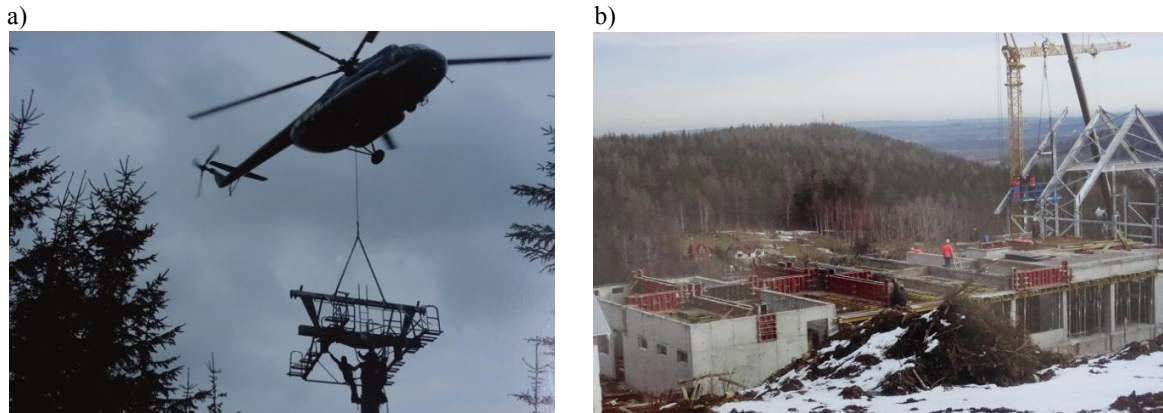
(a) a helicopter used to transport elements of the gondola lift [23]; (b) a construction site of a gondola lift station [23].
